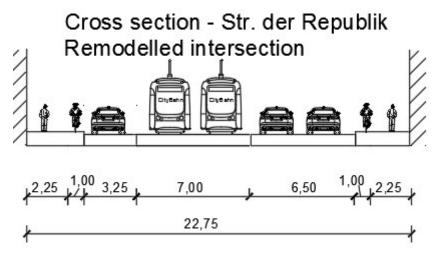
Cross section of the Straße der Republik (remodelled intersection)
